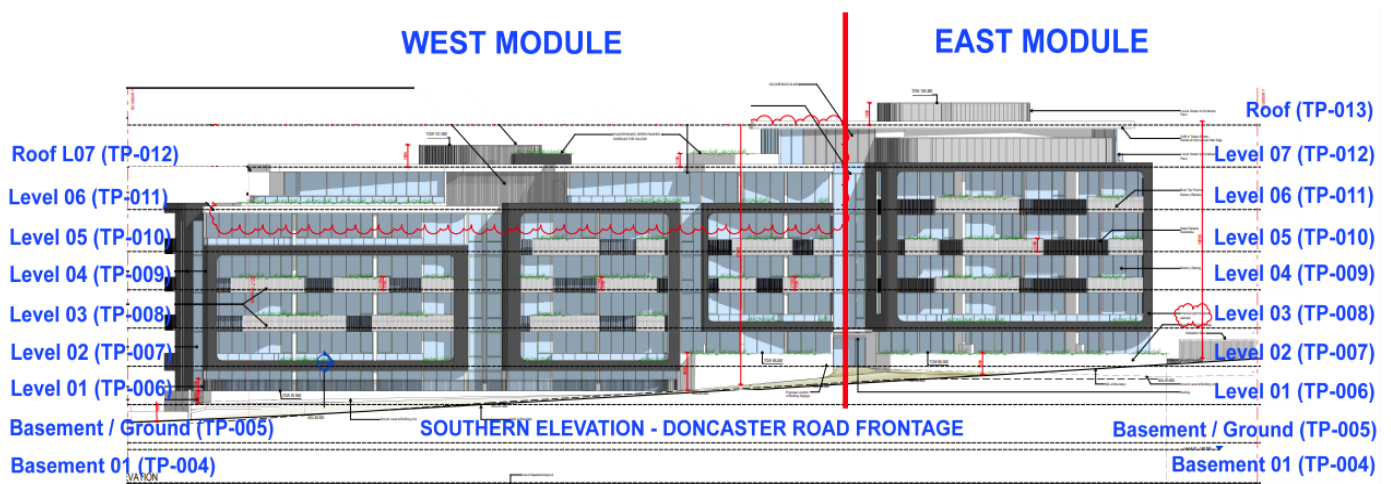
Southern Elevation with Plan Levels and Plan Page Number (reference Decision Plans)
